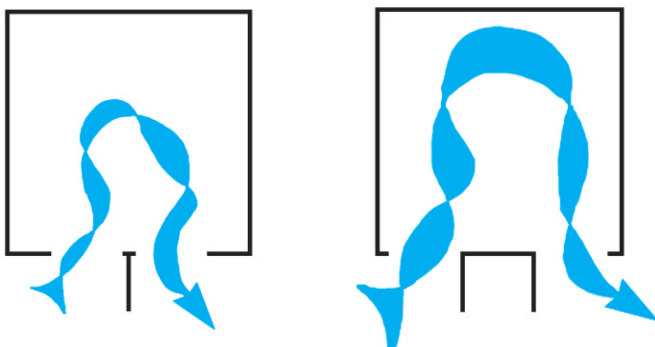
Window Arrangement for Cross Ventilation (Same Wall).
